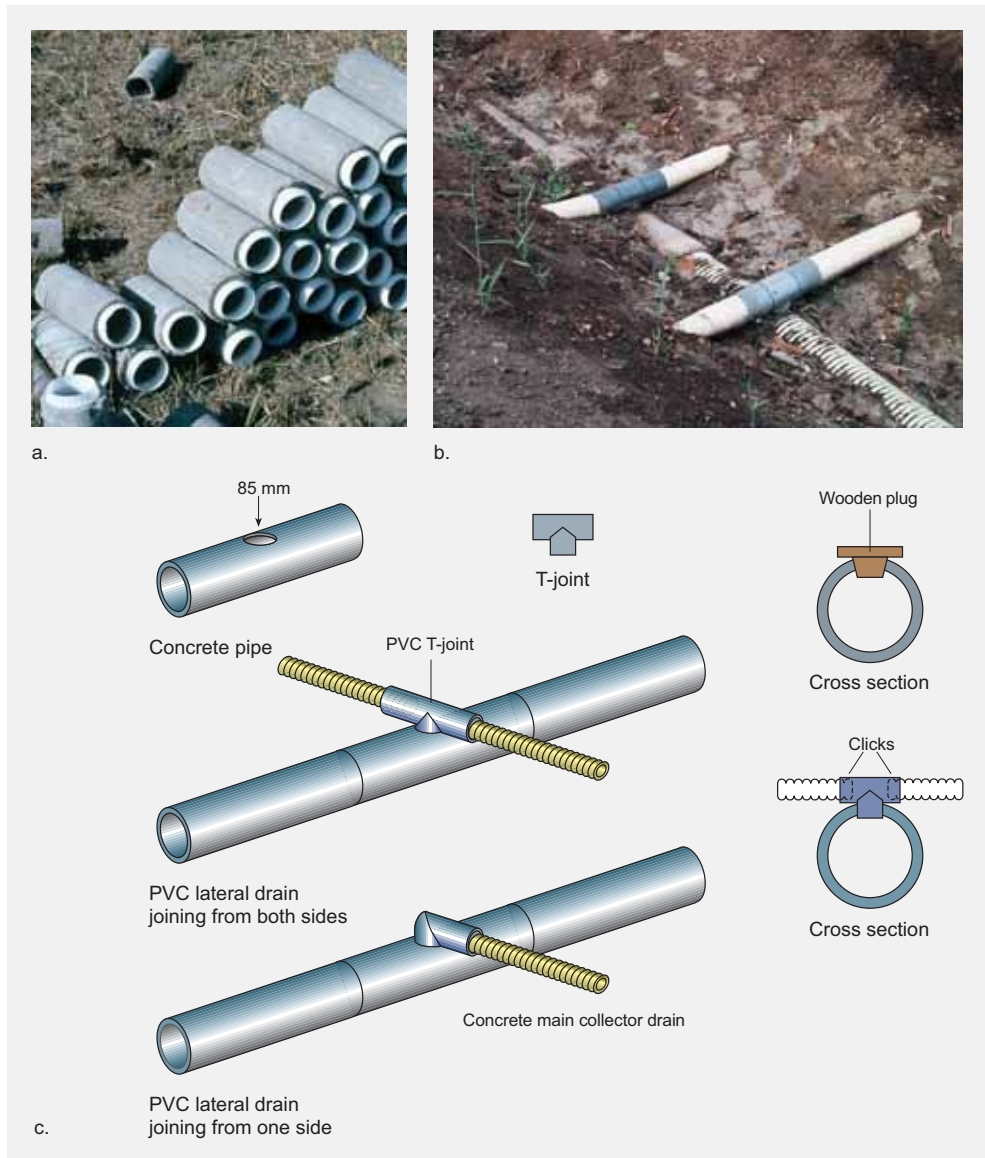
Pipe connectors between (a) field drains and (b) field and collector drains
